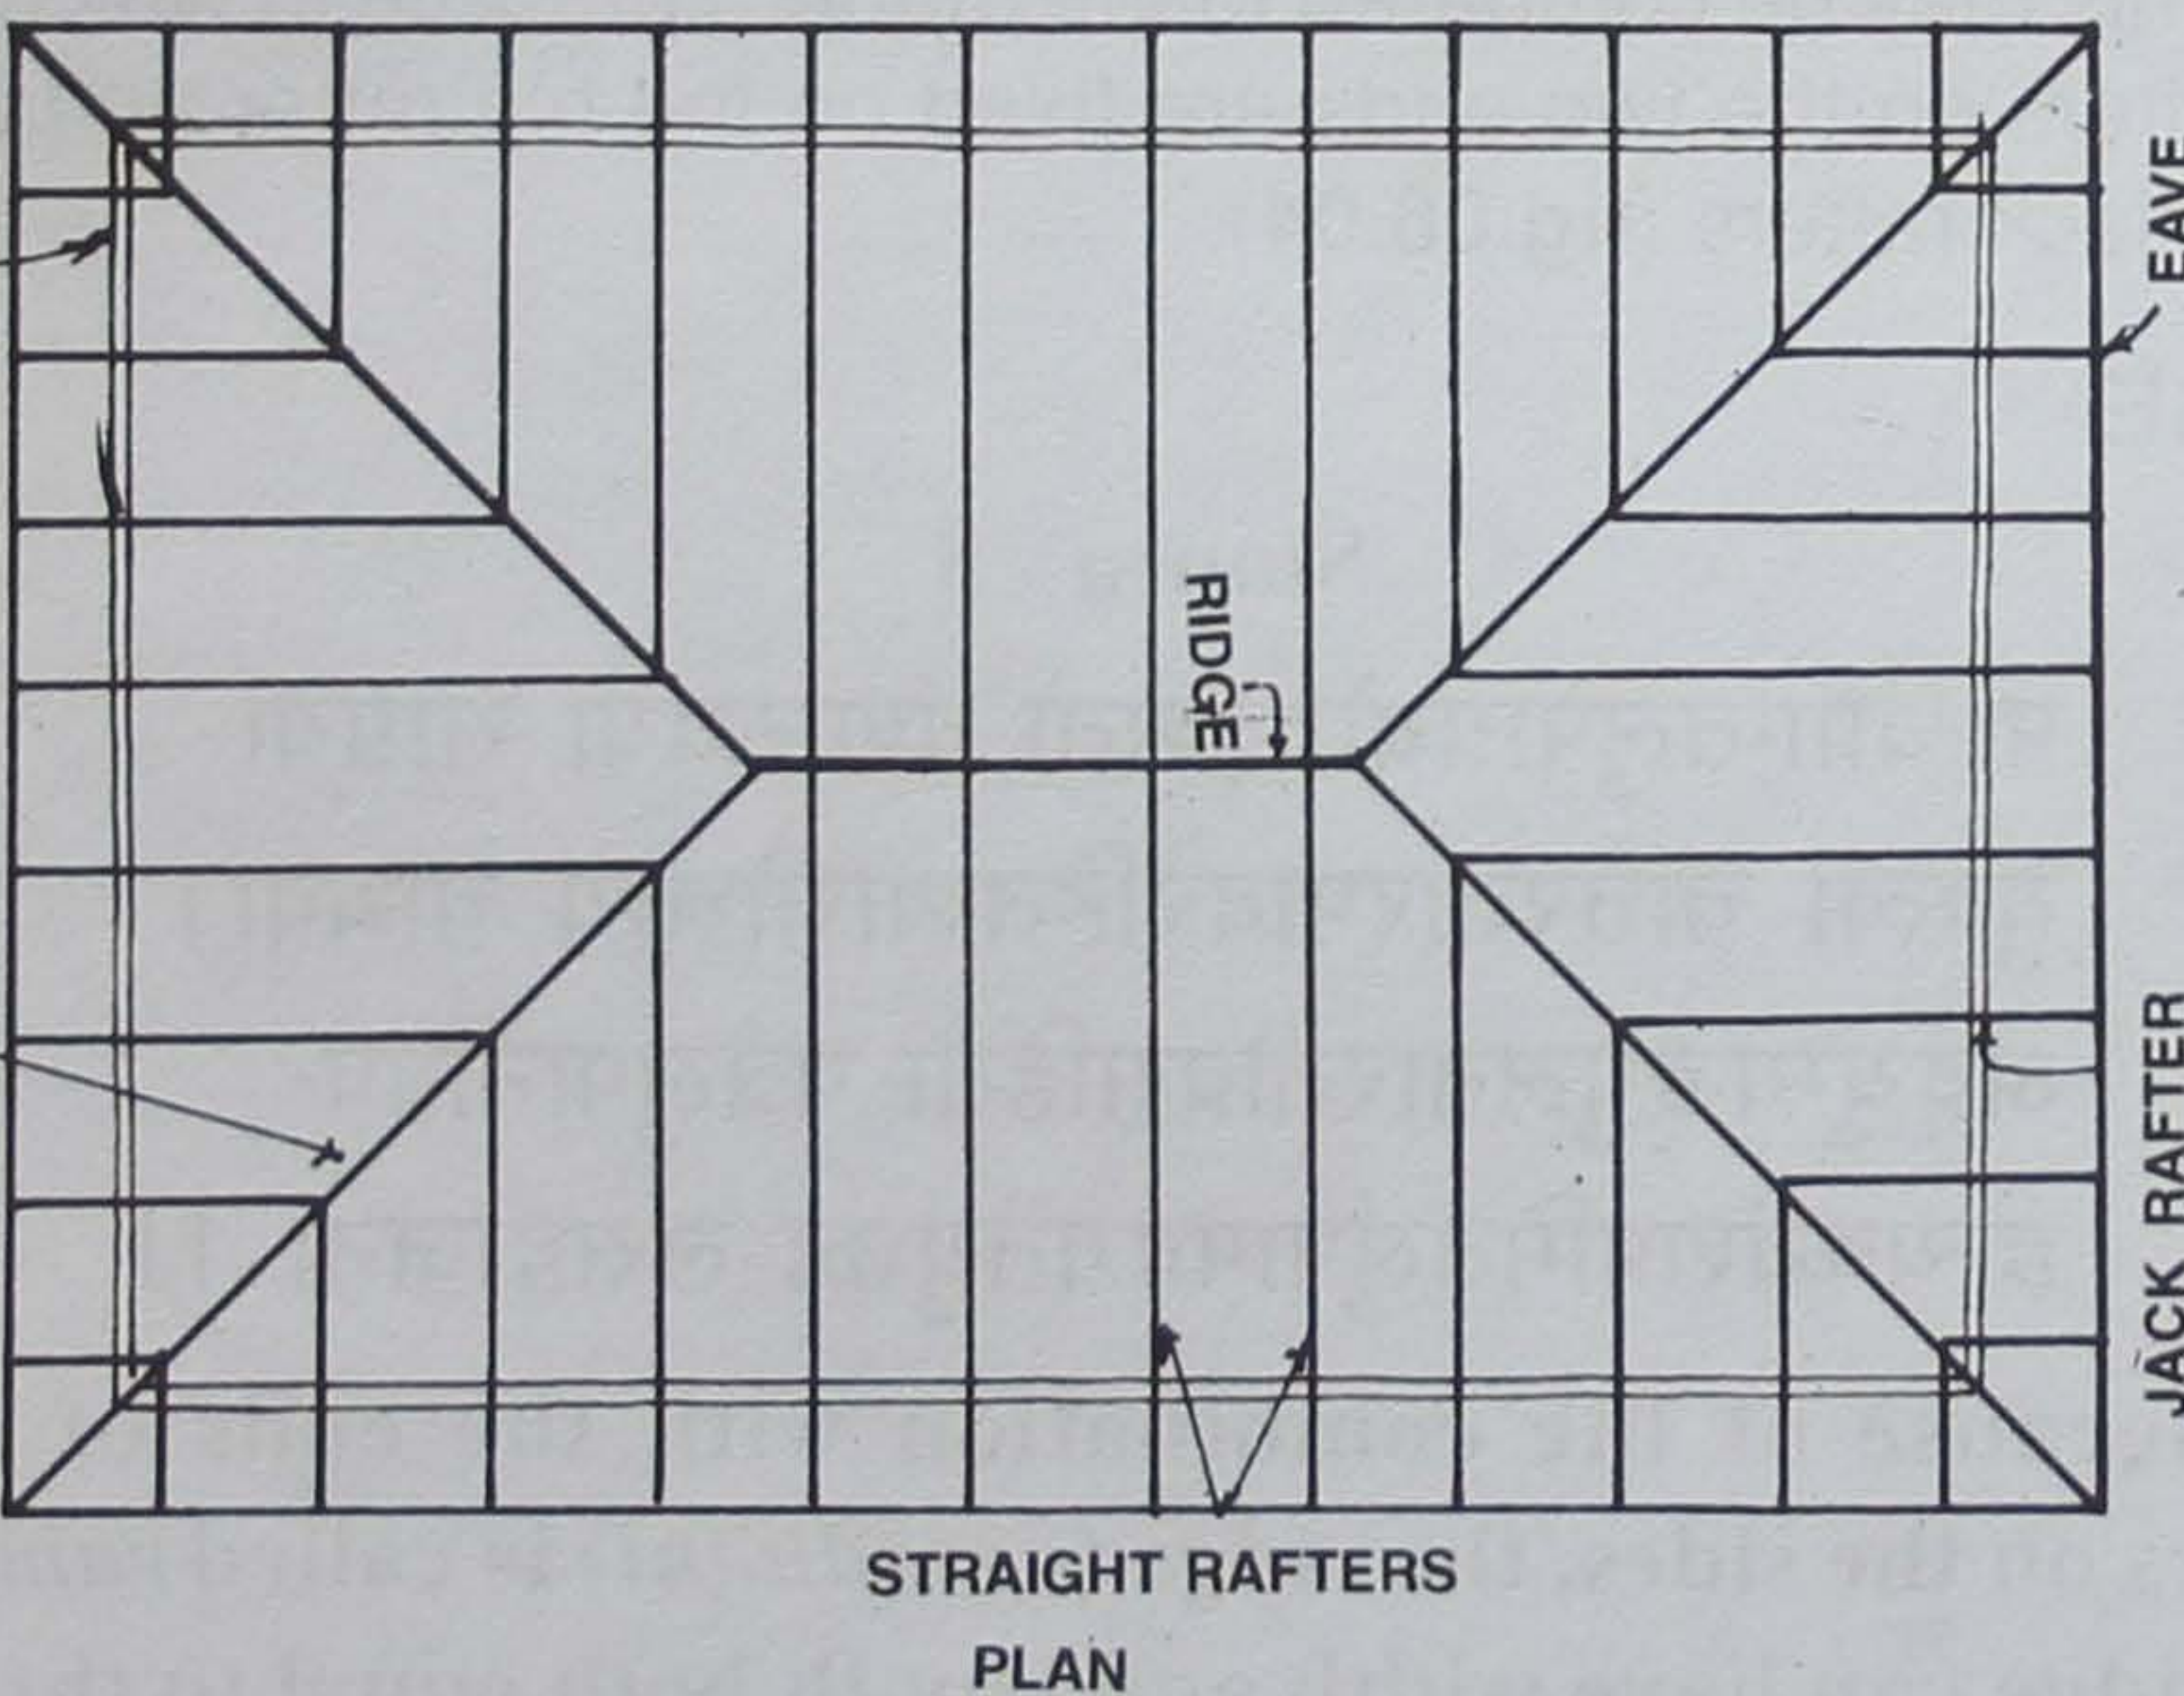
ROOF SHOWING JACK RAFTERS
